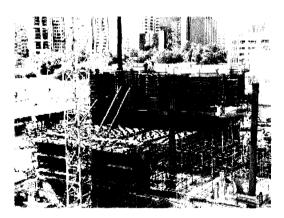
Lift Shaft wall configuration, two floors ahead of slab.
